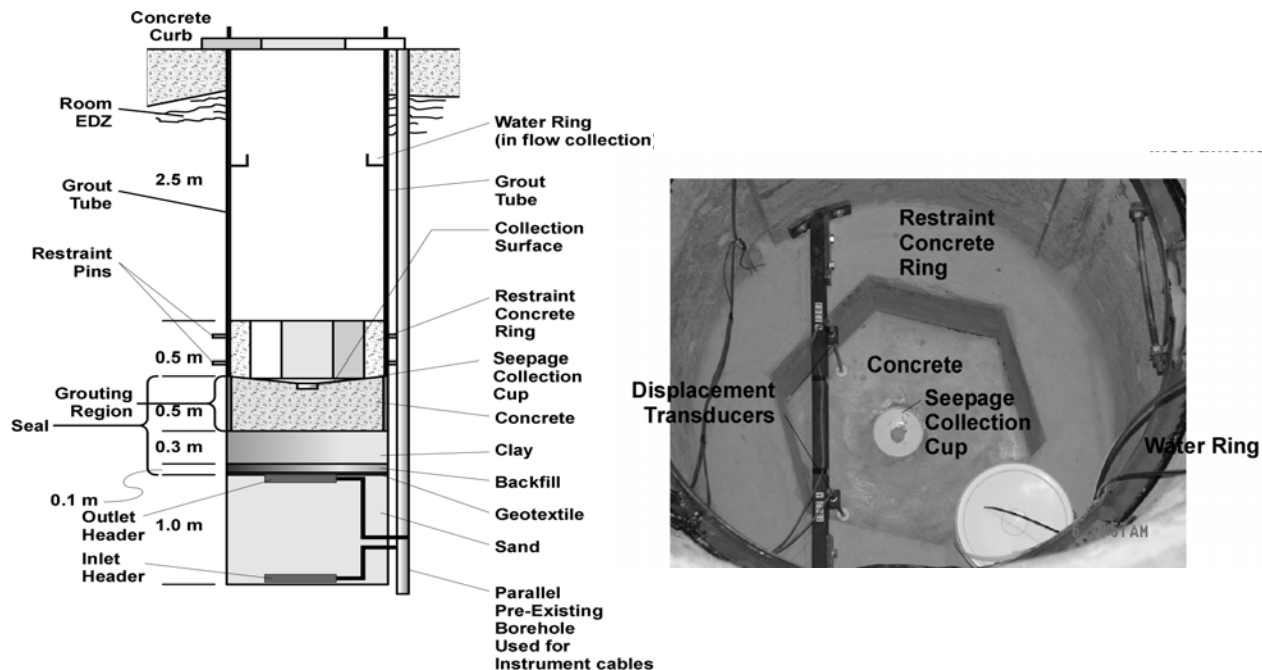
Layout of CSE-1 (left) and view of top of concrete (right).^[3]
